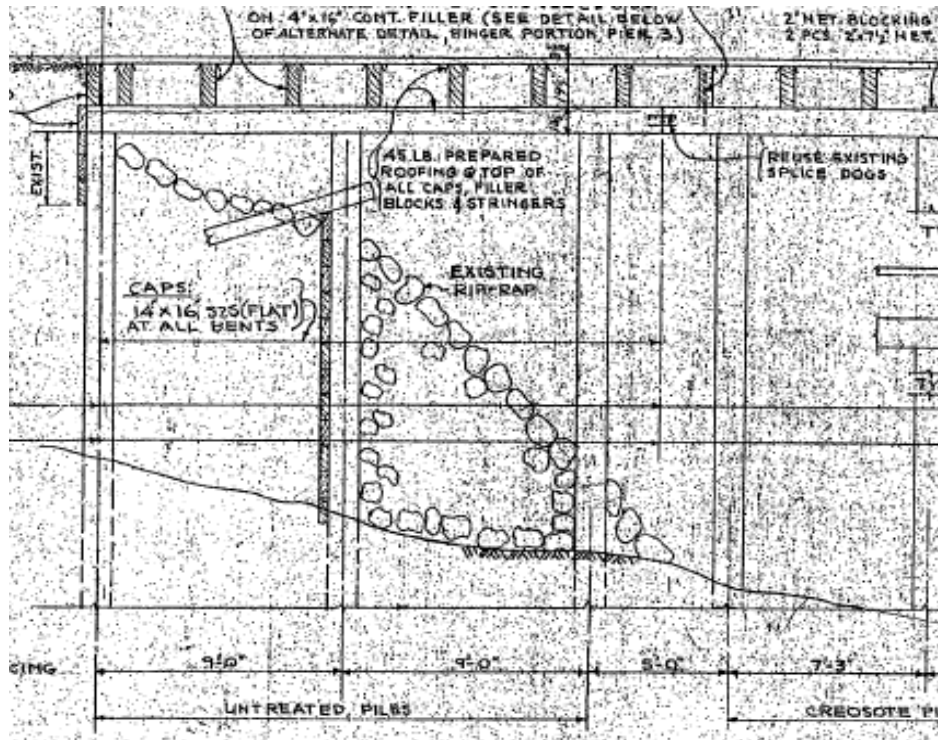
Historical cross section drawing showing under-pier construction with bulkhead structures and riprap slope support. *Source: Port of Tacoma.
